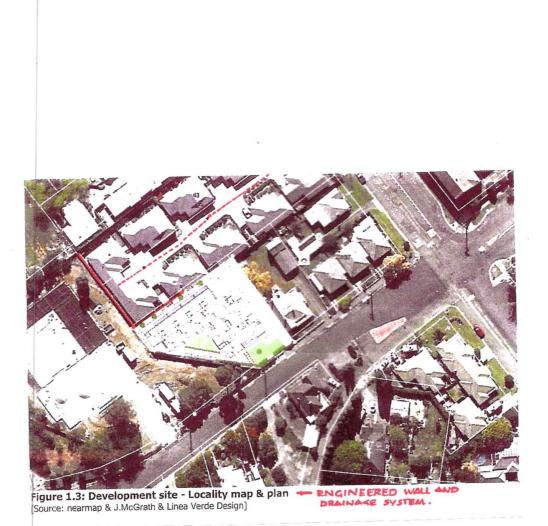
Development site - Locality map & plan - ENGINEERED WALL AND Source: nearmap & J.McGrath & Linea Verde Design]
